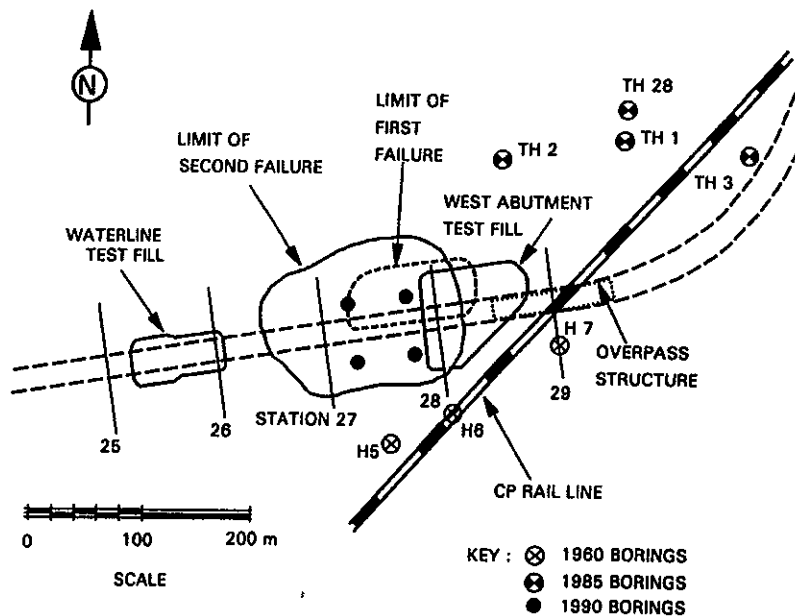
Site plan showing location of test fills and failure zones (after Crawford et al. 1995)
